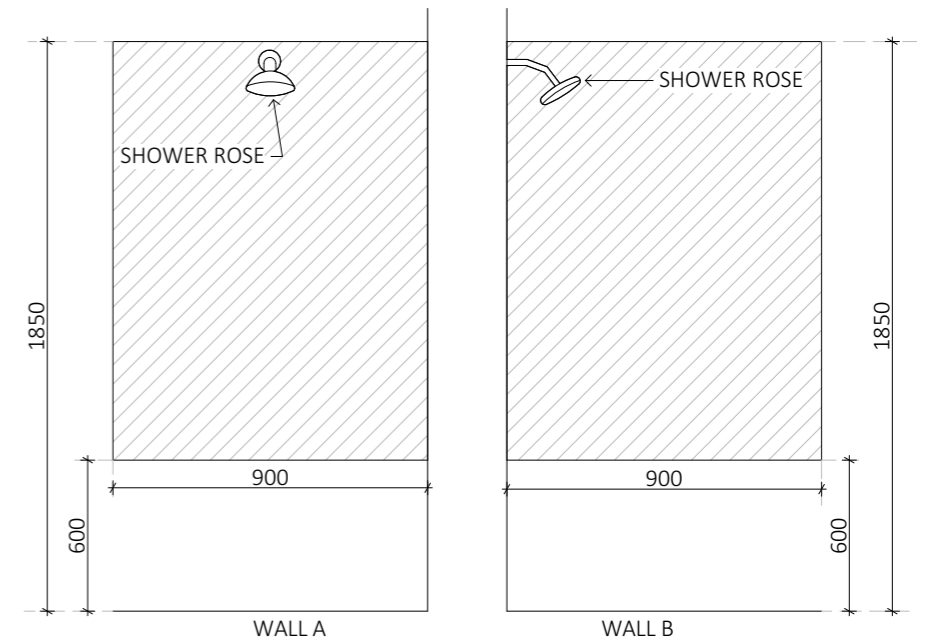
D - LOCATION OF SHEETING FOR SHOWER WALLS
